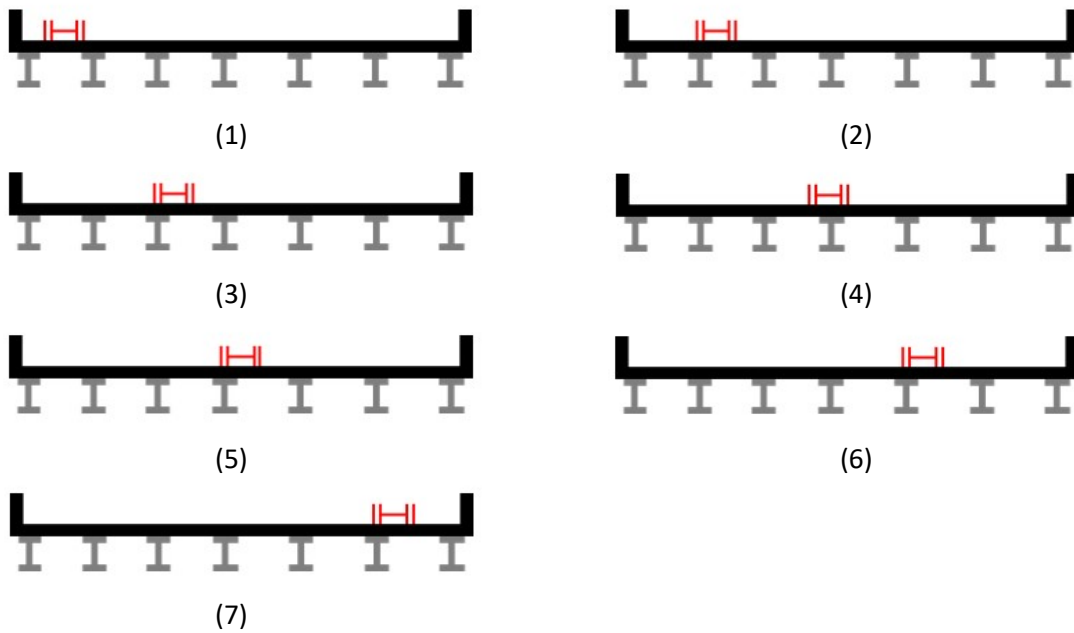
Truck positions for live load tests of steel-reinforced bridge deck (27W36)
